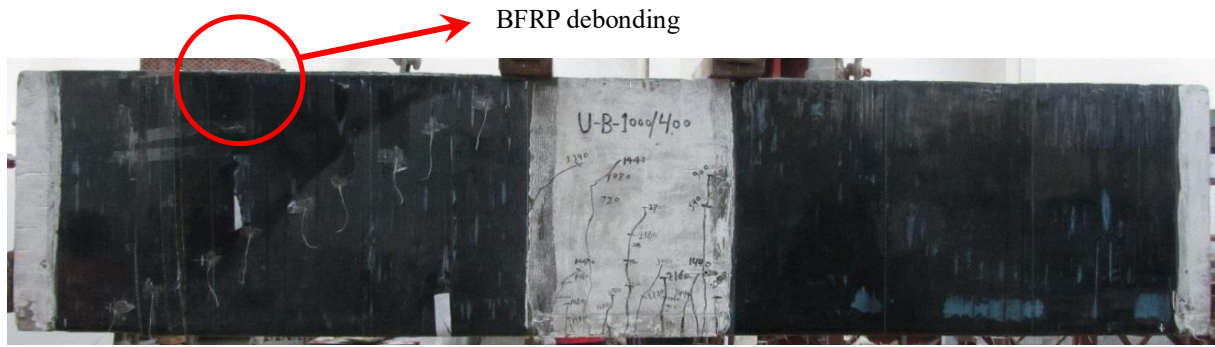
Strengthened beam crack pattern (U-B-1000/400)
